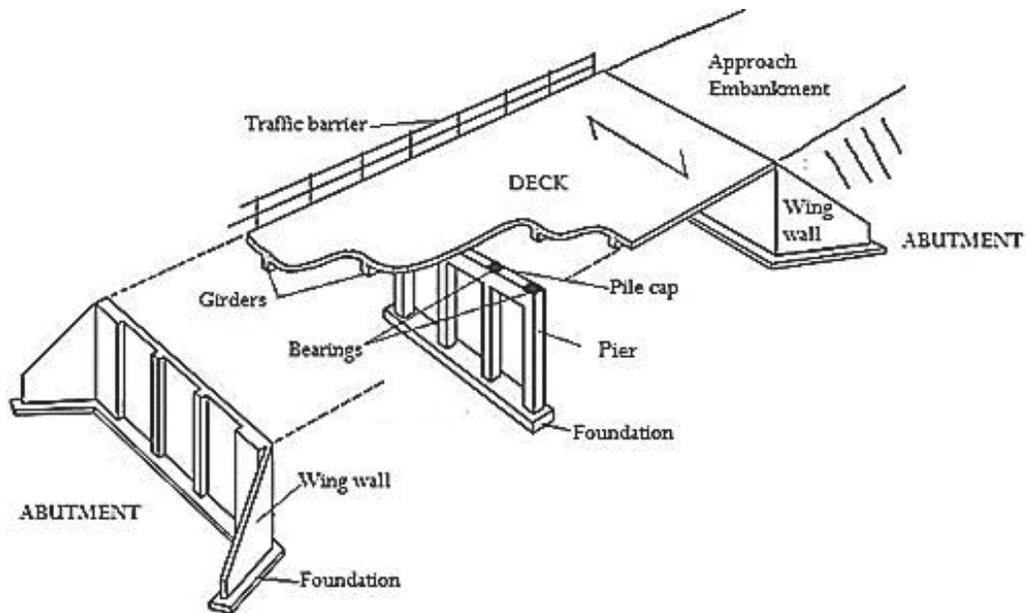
Schematic representation of typical highway bridge structural components.
